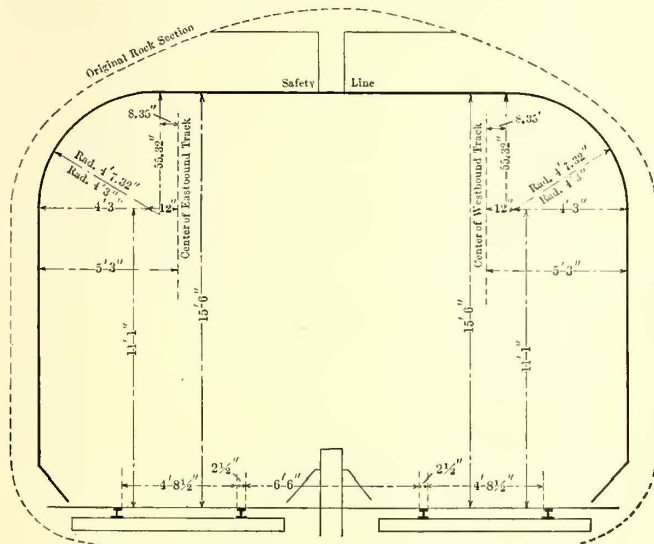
Hoosac Tunnel—Section of Tunnel
